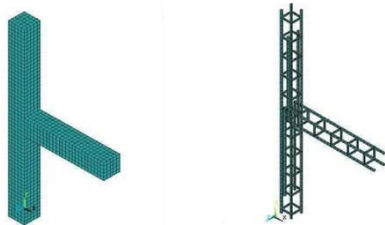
Typical View of ANSYS Model and its Details Source: Vijaya et al., 2014
